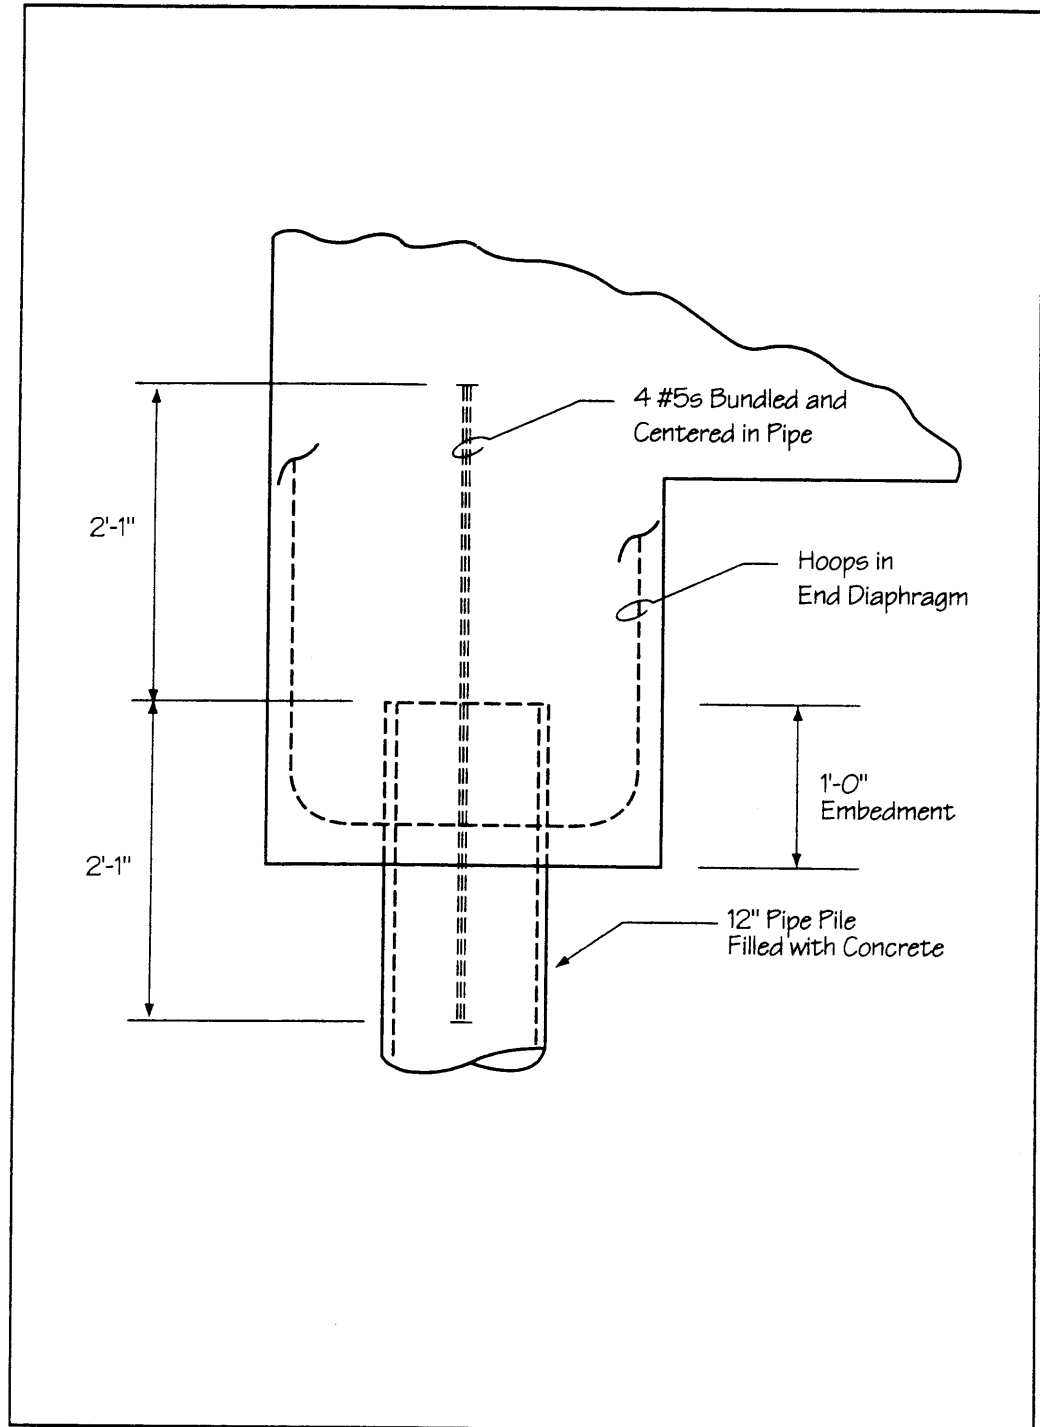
Detail of Pipe Pile-to-End Diaphragm Connection
